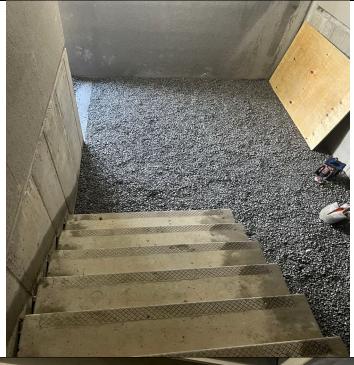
Looking east, progress of backfilled staircase landing with ¾" stone.
